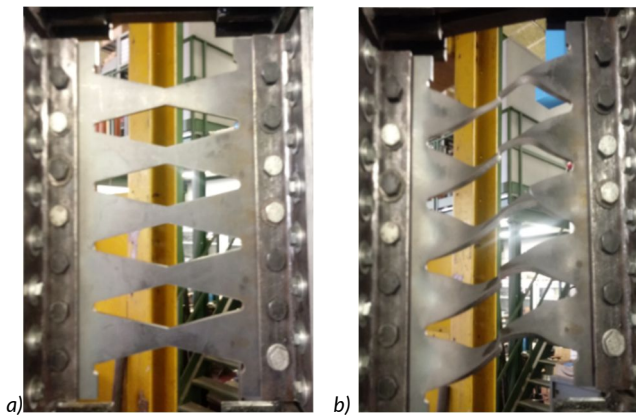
Photo of Specimens A3: a)Start of the test,b) Fracture-end test
